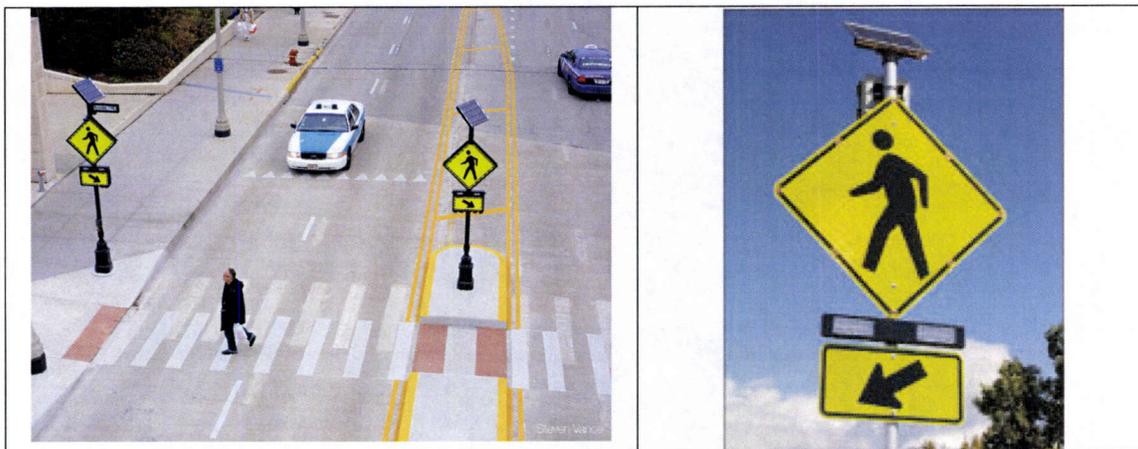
Typical RRFB Crosswalk on a Multi-lane Street
